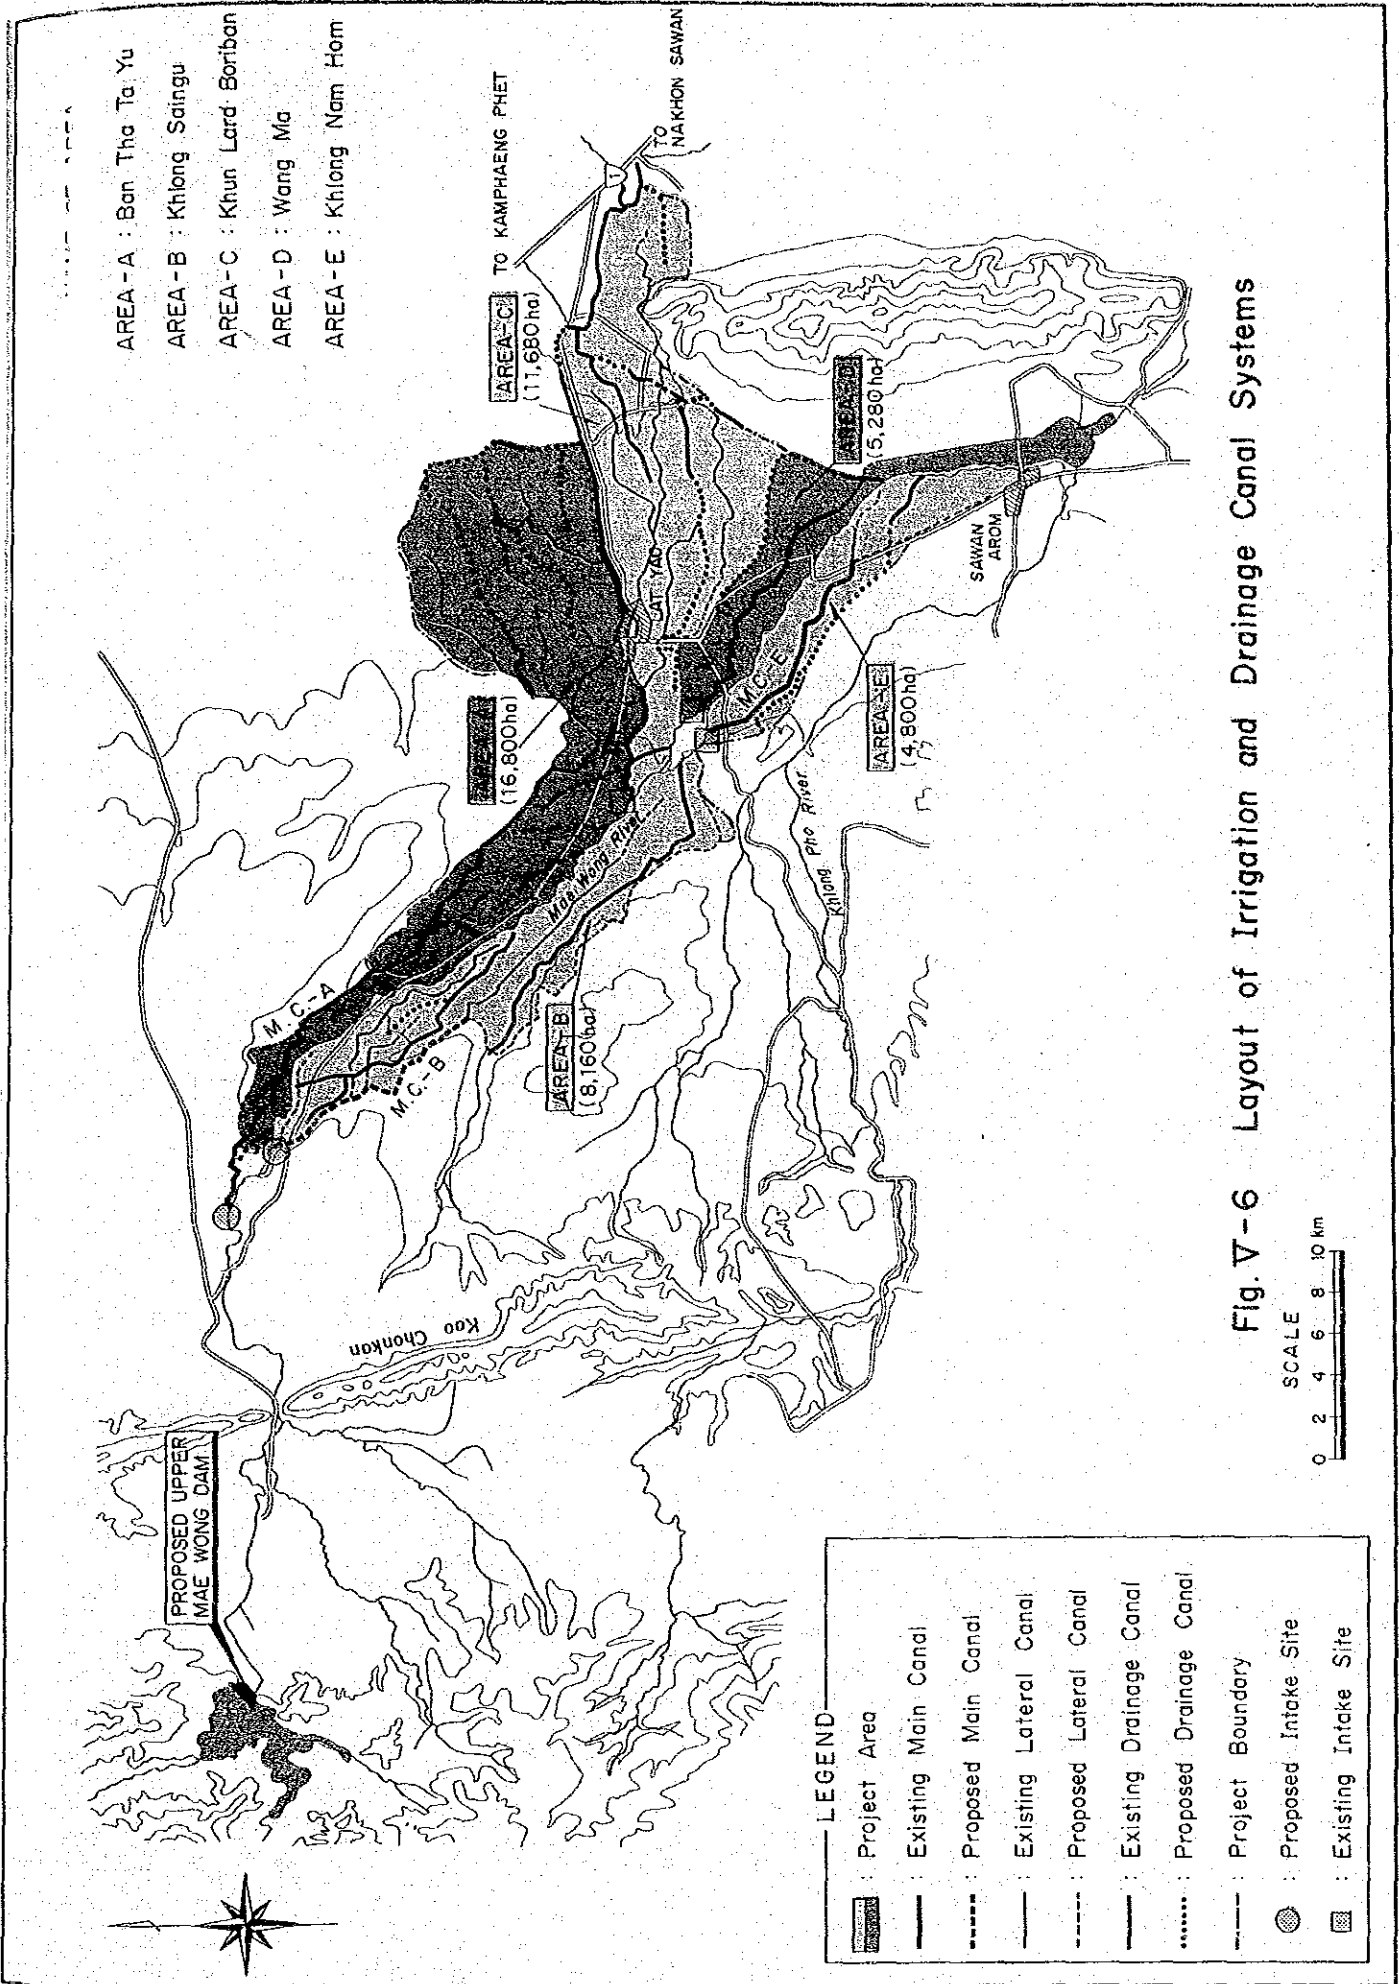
Layout of Irrigation and Drainage Canal Systems
